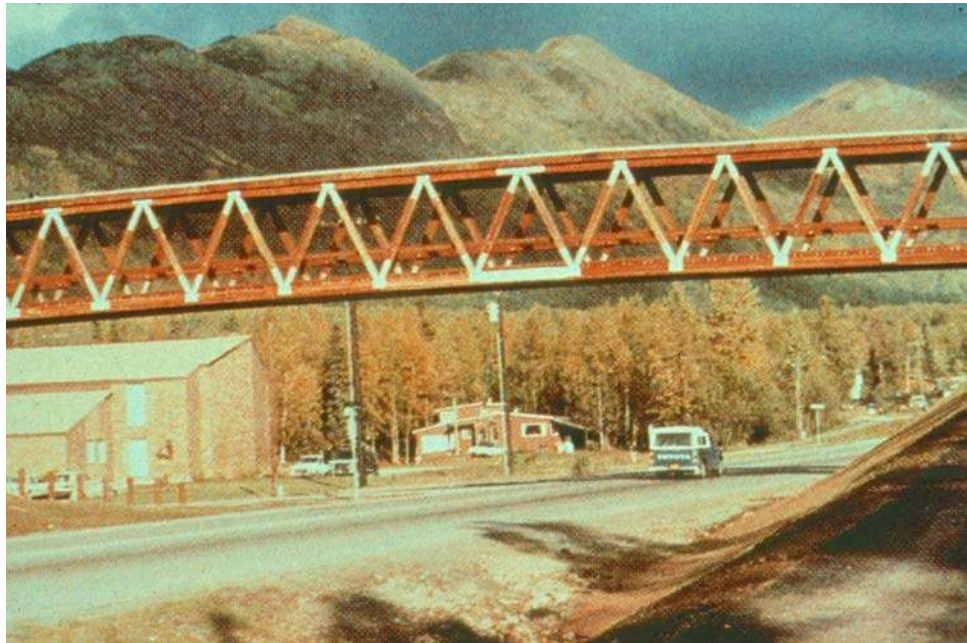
Parallel Chord Truss Pedestrian Bridge (Eagle River, Alaska)
